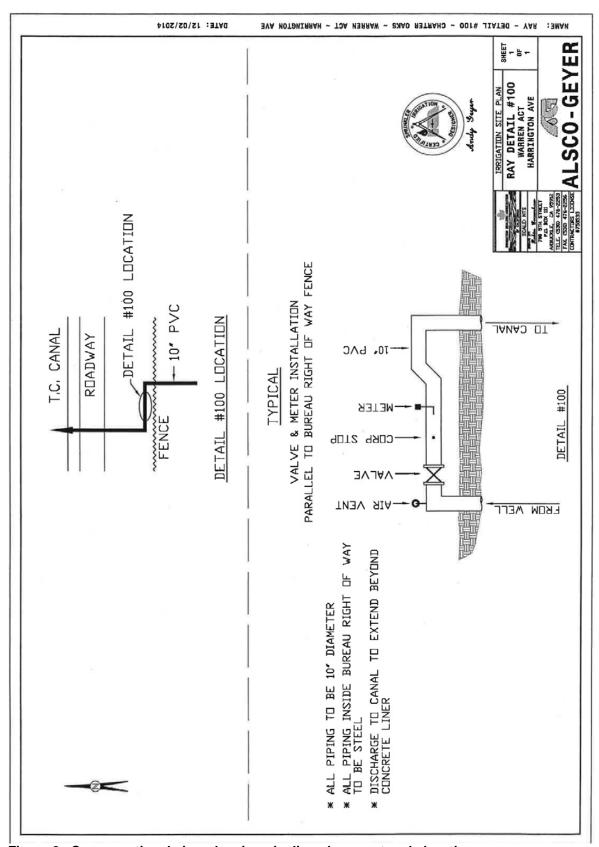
Cross-sectional view showing pipeline placement and elevations.
